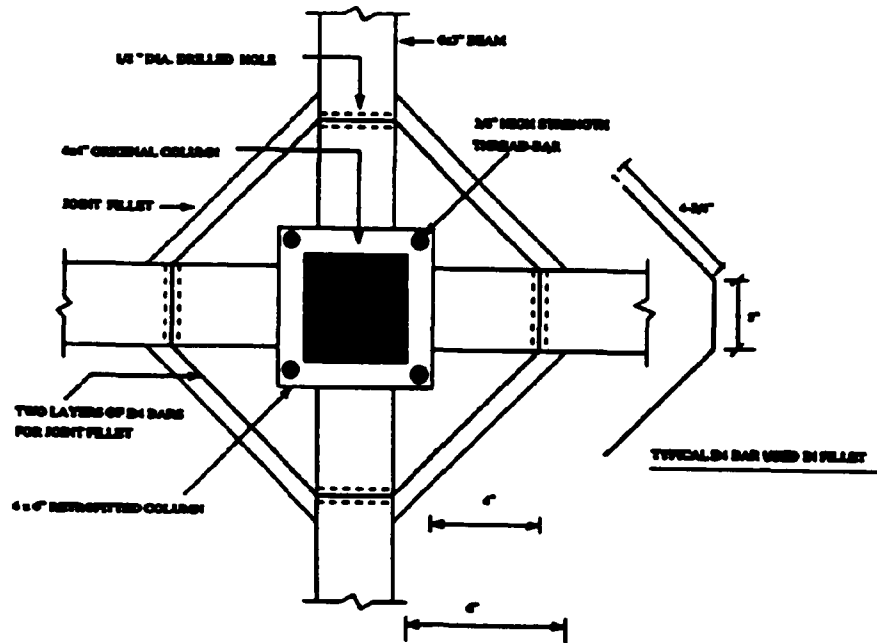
Detail of Fillet Reinforcement for Specimen
